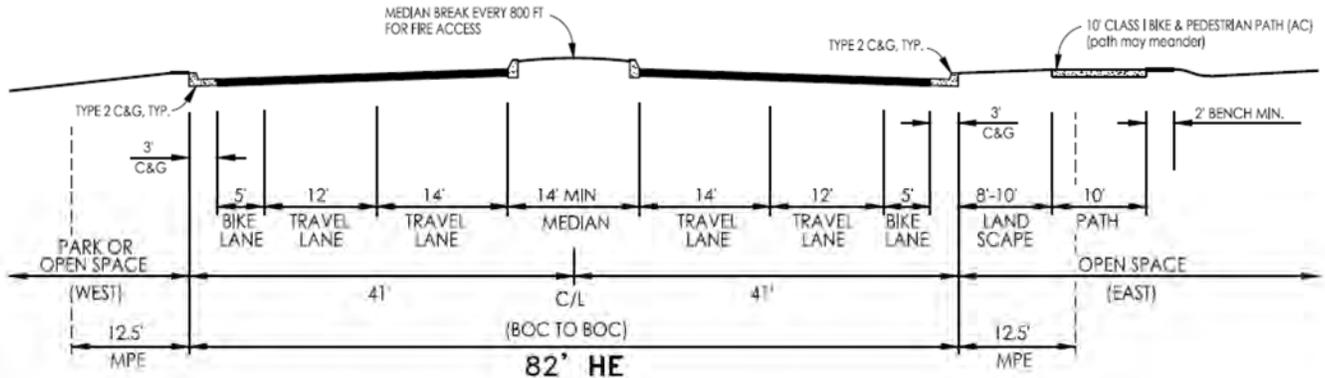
| Bickford Ranch Road – Sierra College Boulevard to School Ranch Road
